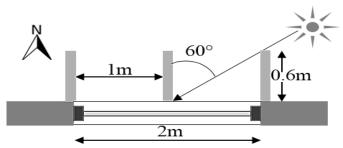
Recommended Depth of Vertical Fins for North Oriented Windows a Plan View (by author)
